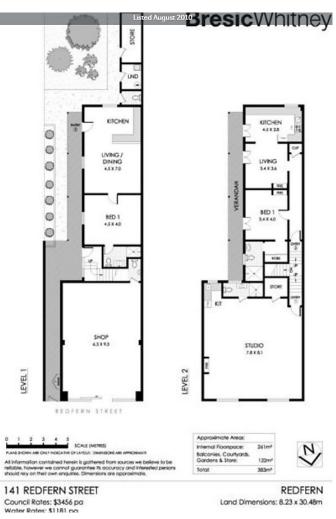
Real estate floor plan of ground and first floor, 141 Redfern Street, Redfern.
